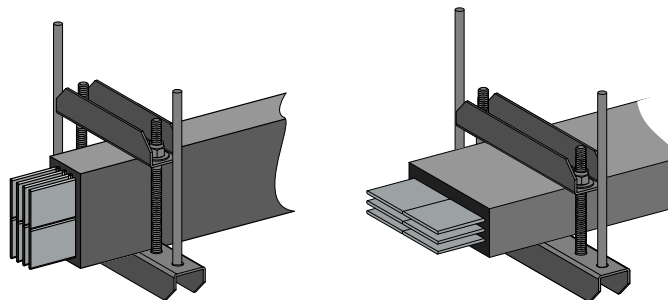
Example of a ceiling mounted element: suspended Installation
